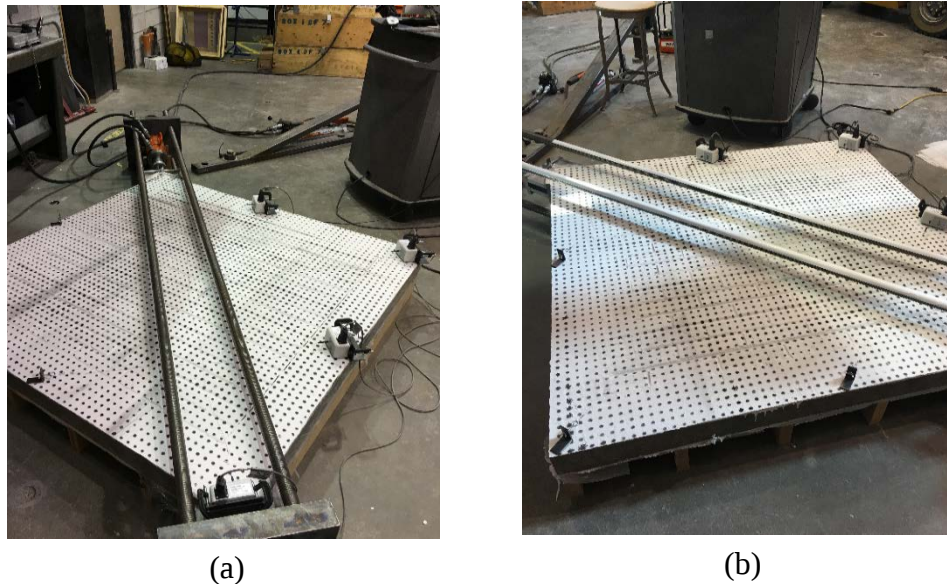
Ready to test (a) masonry infill and (b) confined masonry walls with completed DIC preparation and potentiometer and loading apparatus
